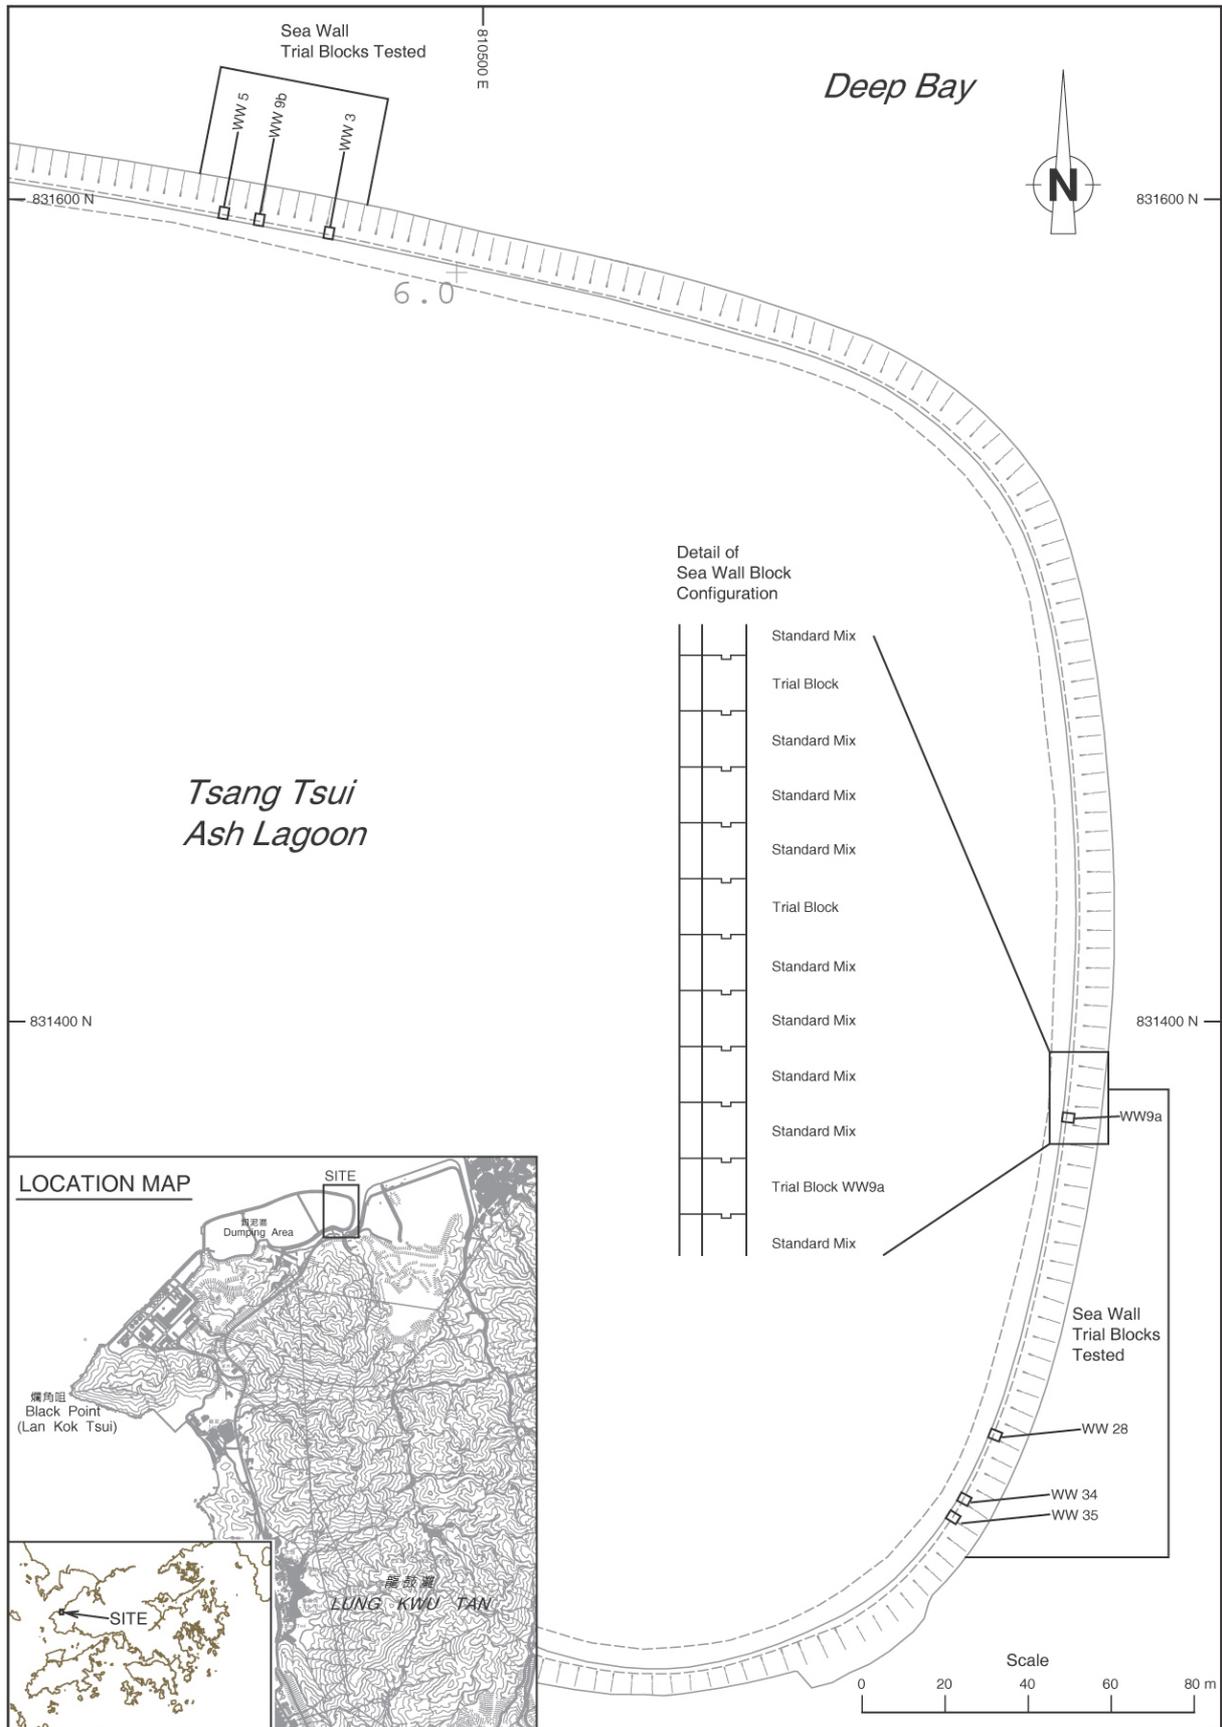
General Location of Tsang Tsui Ash Lagoons and Layout of Seawall Blocks
